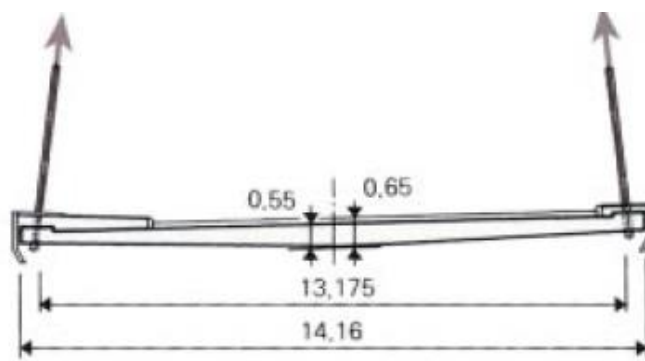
Steel Cross Sections (Svensson, 2012)
